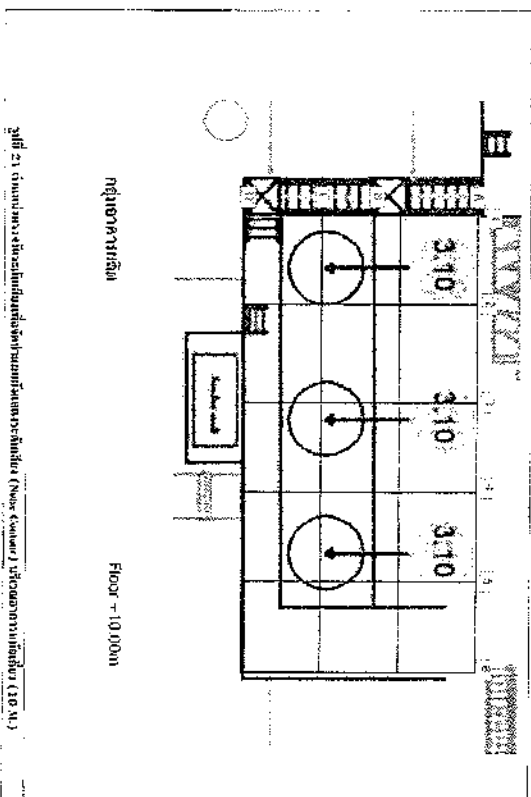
Floor plan of a room with three circular tables and a rectangular table. The room is labeled 'Floor +10.00m'.
